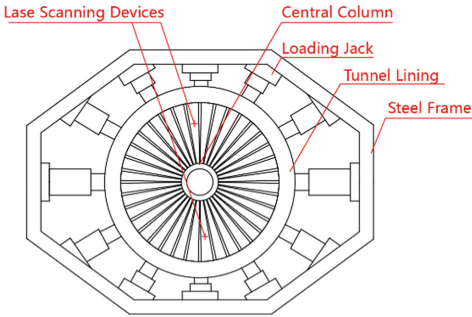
Layout of the full-scale model test system for circular shield tunnel
